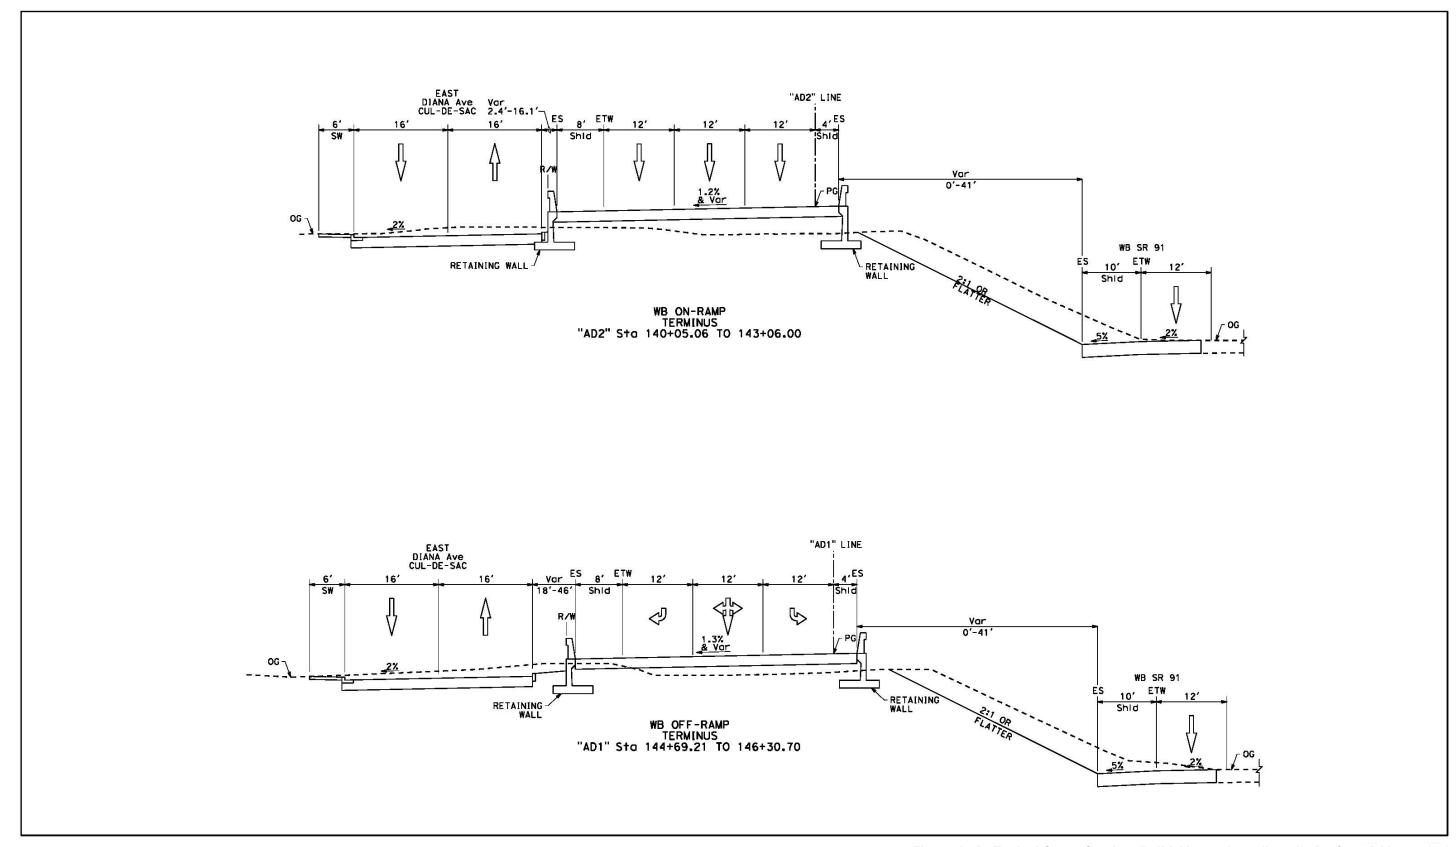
D. Typical Cross Section, Build Alternative 7 (Locally Preferred Alternative)
